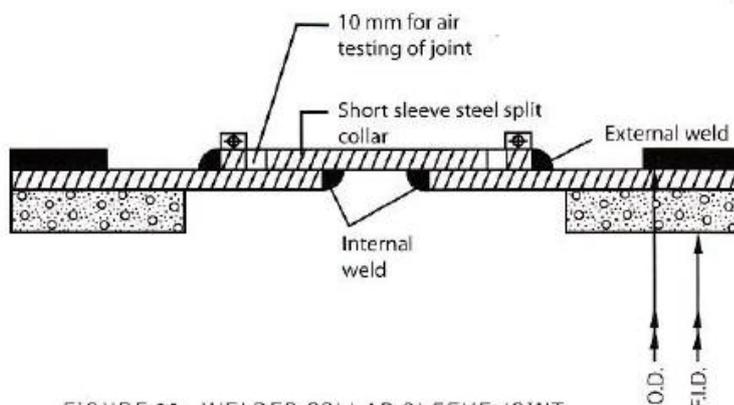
WELDED COLLAR SLEEVE JOINT
